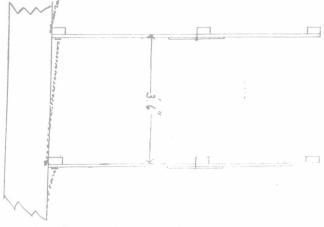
Ground-floor plan of Mr. Wells' cow stall.
